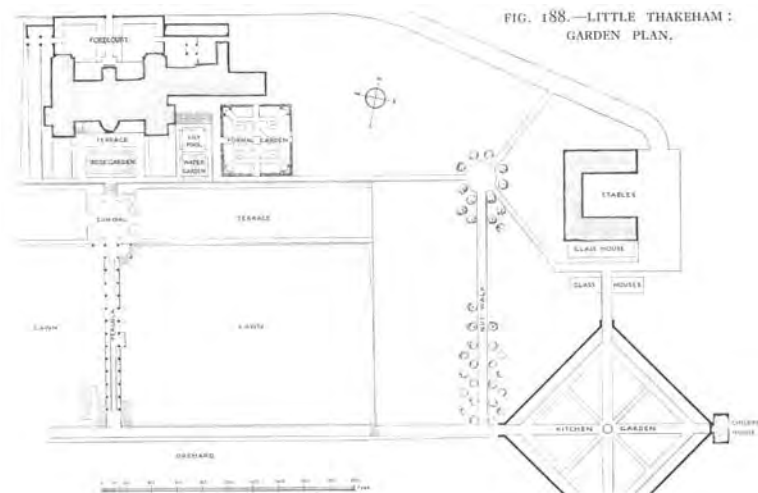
LITTLE THAKEHAM : GARDEN PLAN.
